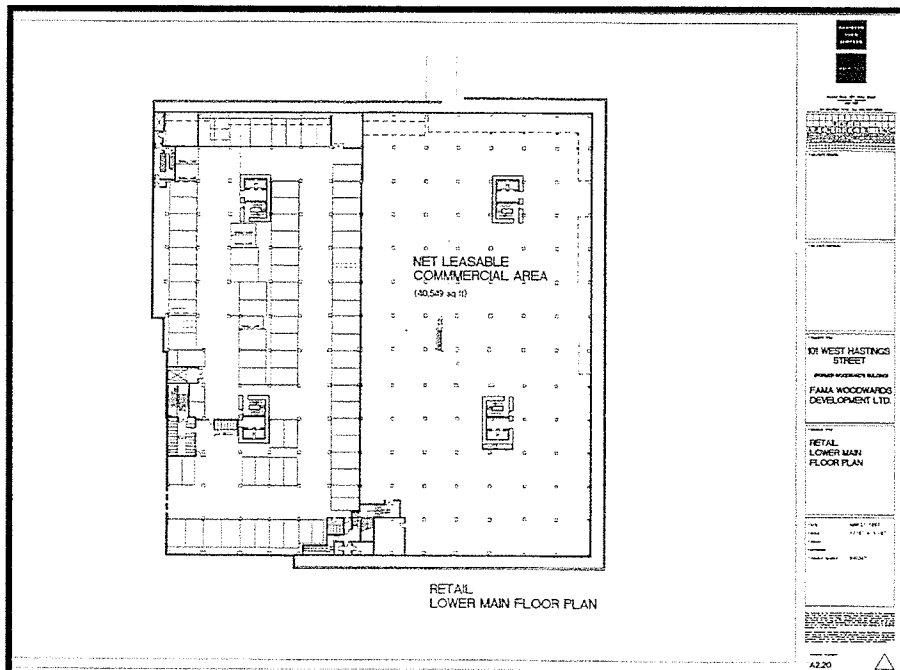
Proposed Retail Lower Main Floor Plan Compliments of Davidson, Yuen and Simpson
